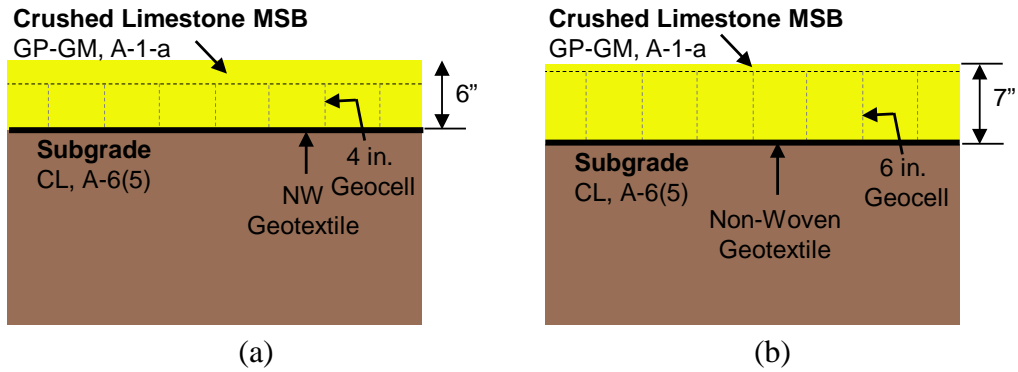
Pavement foundation profiles with (a) 4 in. geocells on 3rd St. North, and (b) 6 in. geocells on 3rd St. South
